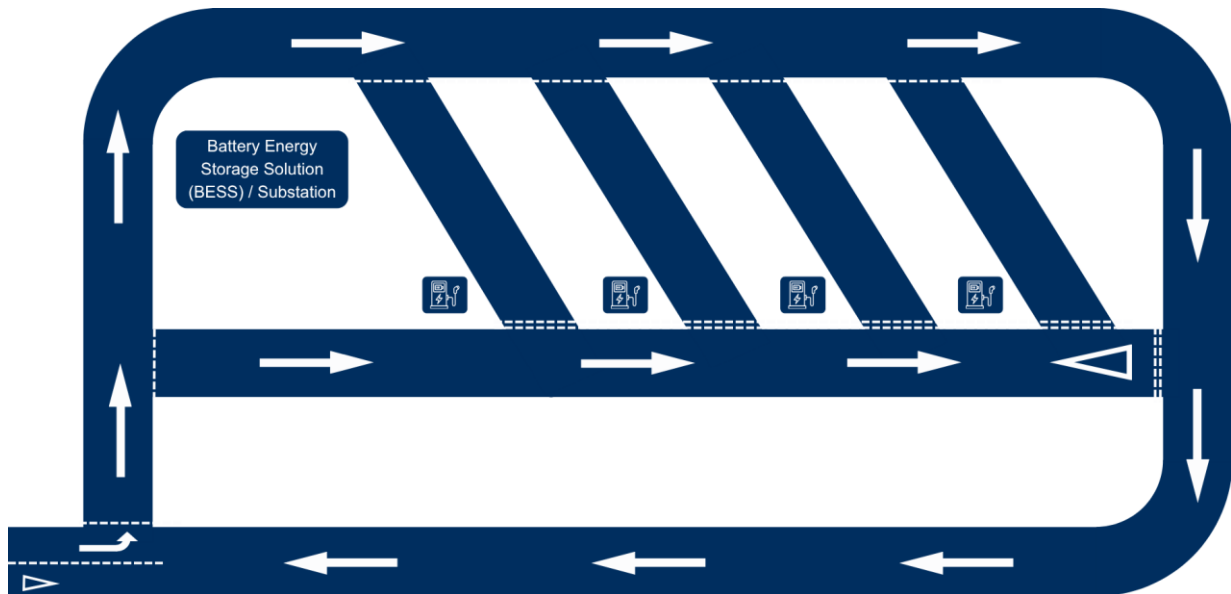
Exemplar plan of eHGV charging site with drive-through bays
